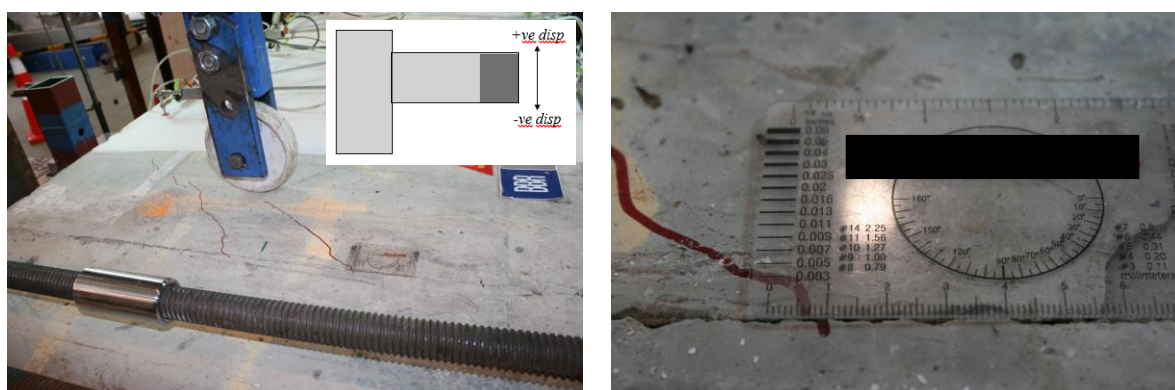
Sliding and diagonal cracking at the mid-span's cold joint.
